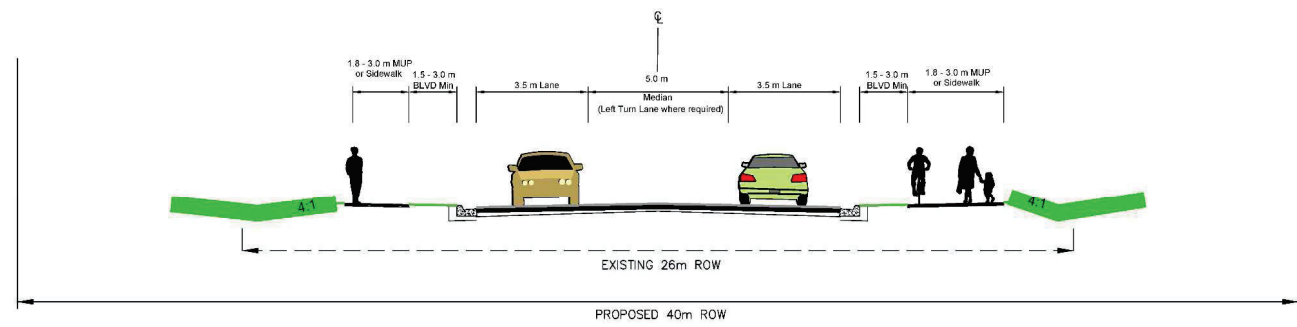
Section 1 Alternative 2 - 3-Lane Urban Cross Section
